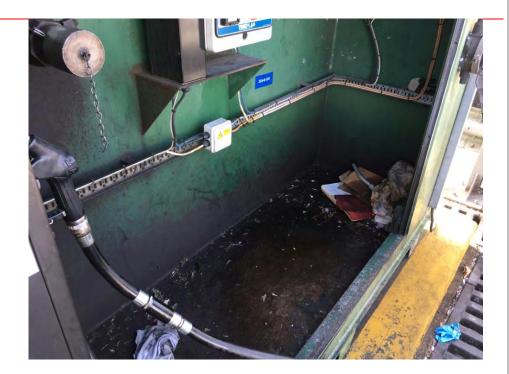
View of the vehicle fuel pump on the southern boundary of the Proposed Development site (facing south)	Plate 04 : Staining on the inside of the fuel pump located on the southern boundary of the Proposed Development site
